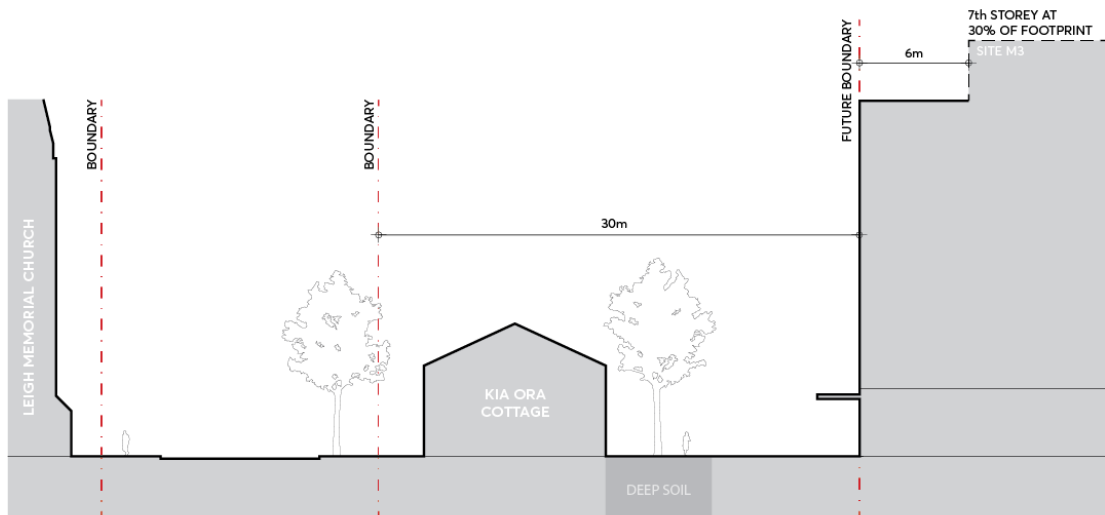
Kia Ora Interface (Section A) Setback & Building Height
